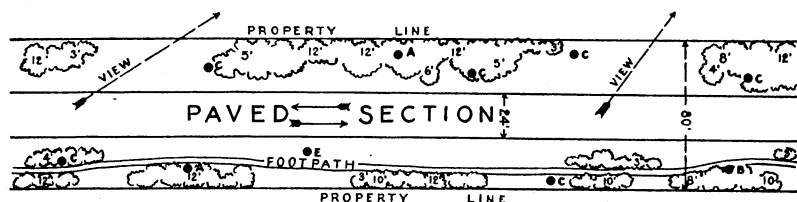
An 80-foot right of way with a 24-foot improved road planted informally, leaving 27 feet of planting space on each side. The footpath winds along one side of the road. The shrubby clumps should be composed of plants from 3 to 12 feet high
